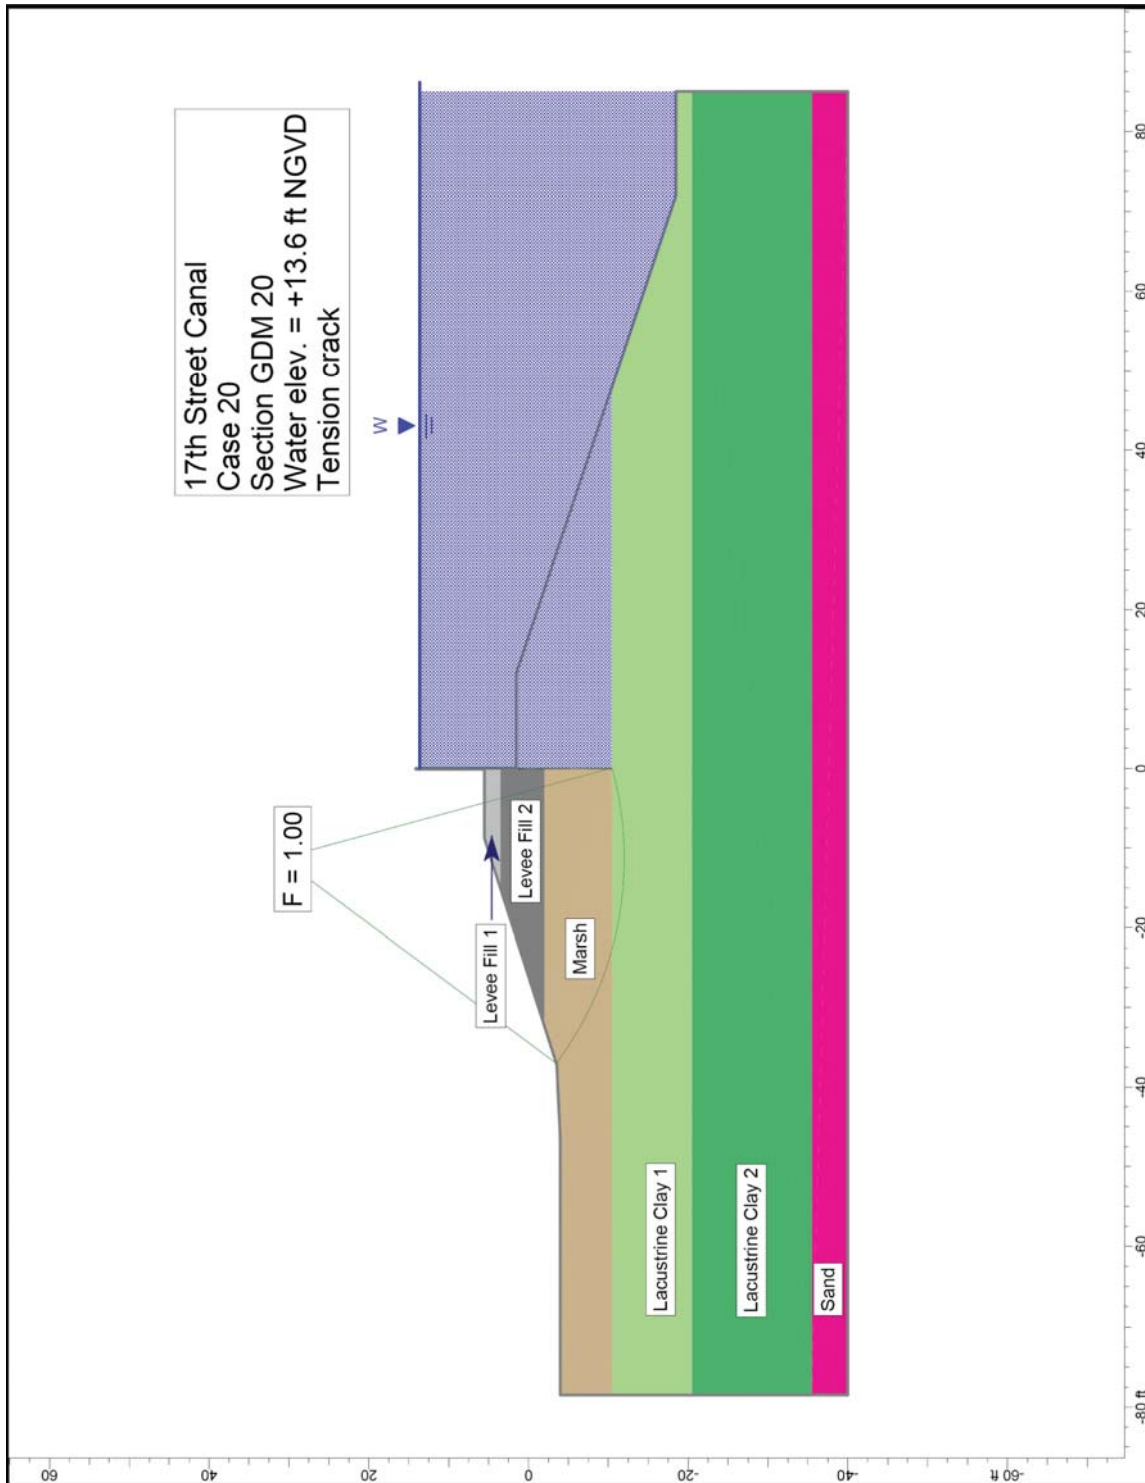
Critical circle for 17th Street Canal Design cross section – water elevation 13.6 ft, tension crack.
